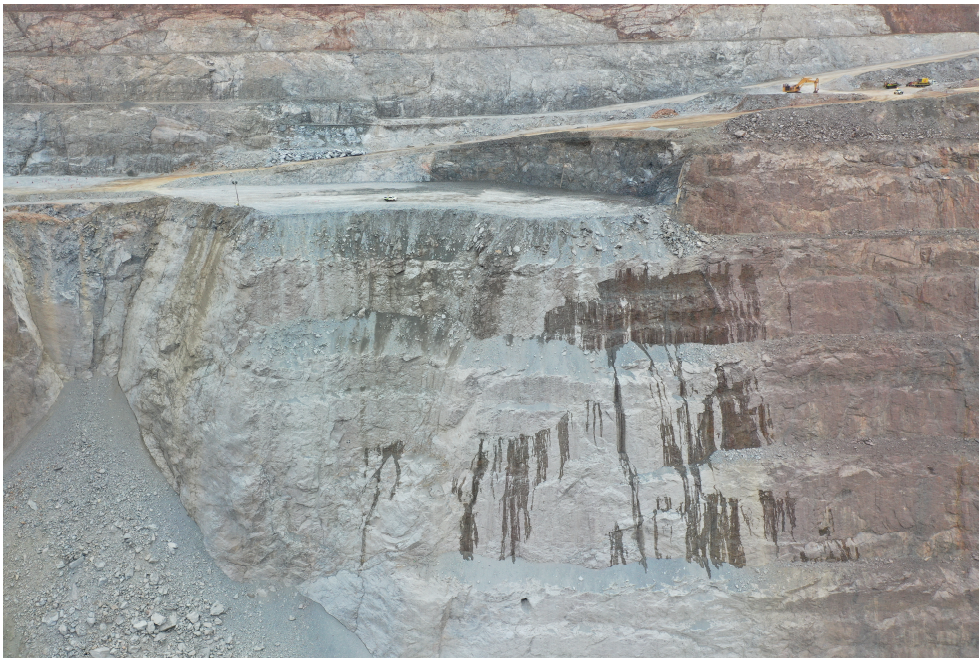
Image of the wall to the south of the East Wall Slip showing water recharge on the slope post-hydroscale
